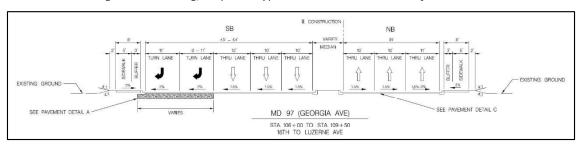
Proposed Typical Cross Section Design – 16th Street to Luzerne Avenue
